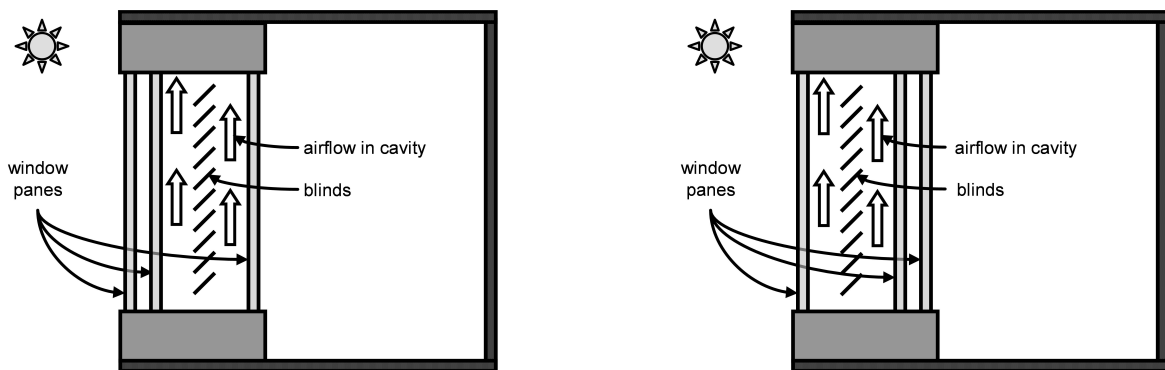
Two types of airflow windows. The double-glazing can be positioned closer to the inside or outside of the building.
